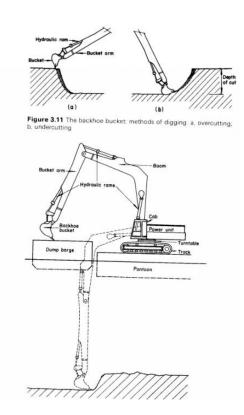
Examples of backhoe excavators dredge works. Not to scale. Extracted from Figure 5.25 in Chapter 5, *Construction Strategy*.
